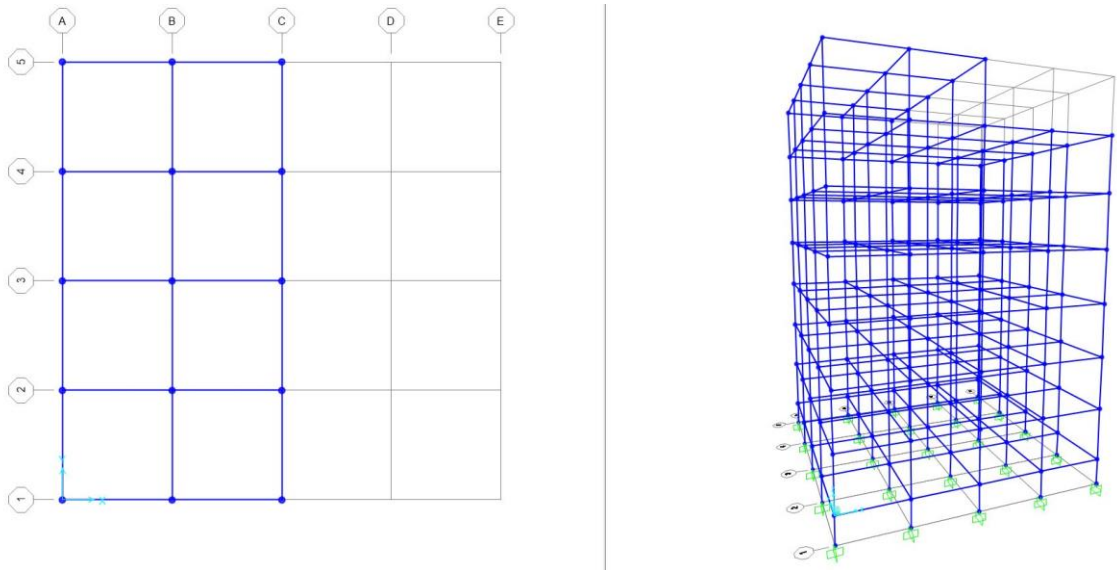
7- storey unidirectional setback building's plan and elevation
